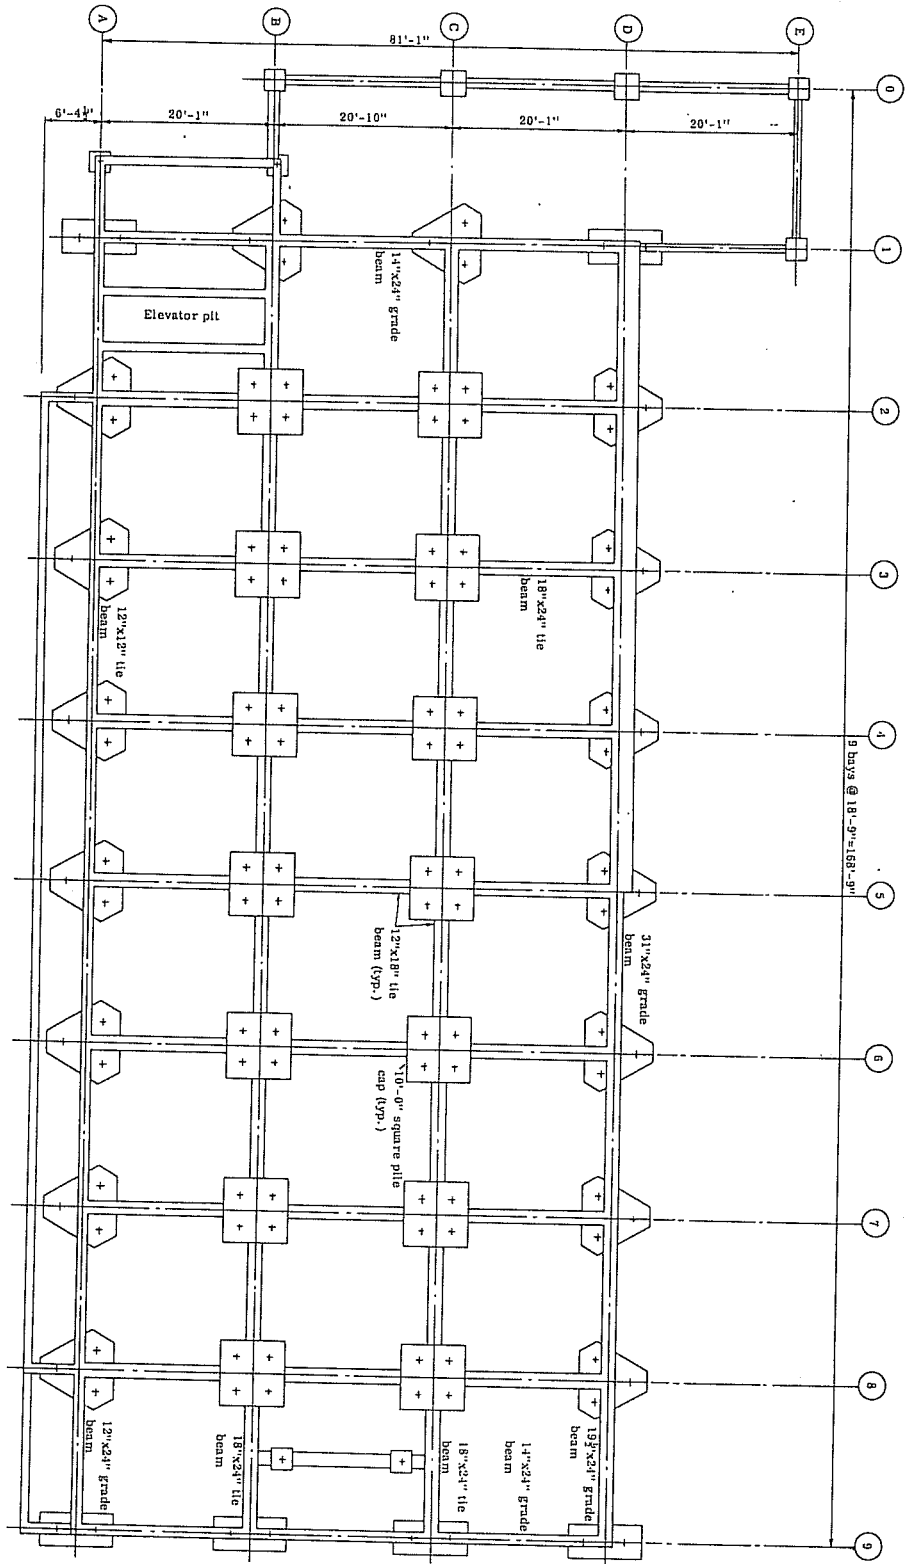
Seven-Story Hotel. Foundation Plan⁶⁸
